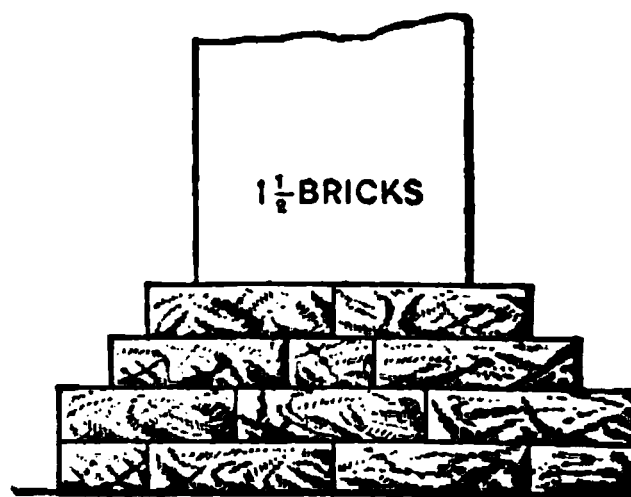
Brick Footing. Wall One and One-half Bricks Thick
